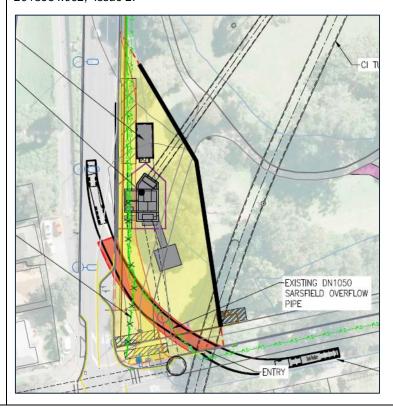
Proposed construction entry from Sarsfield Street and egress onto Curran Street Site General Layout, Watercare drawing CI-STAT&PLAN, DWG no 2013964.003, issue 2.
